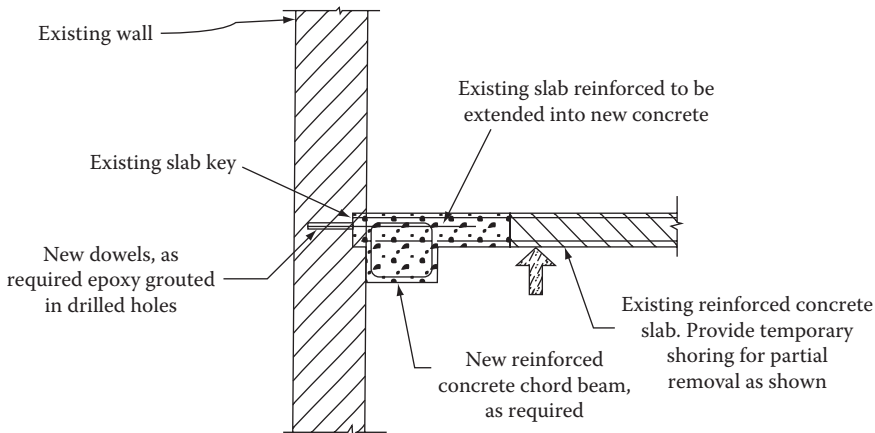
Diaphragm chord for existing concrete slab.
